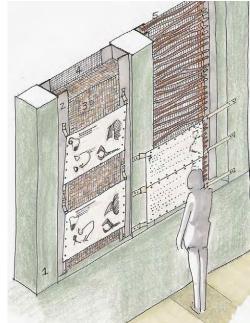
Structured Wall Systems. Welded mesh stone-filled baskets are fixed to steel columns and concrete columns (see section 7, drawings A1 and 2).
